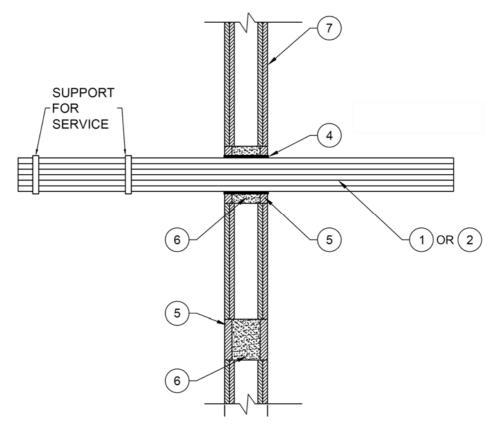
Typical details for cables protected with 3M IC 15WB+ sealant for plasterboard lined walls
